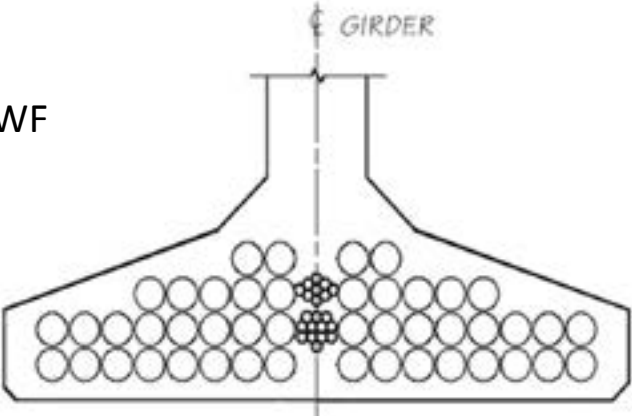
DOT Form 234-048 Girder Elevation Template
